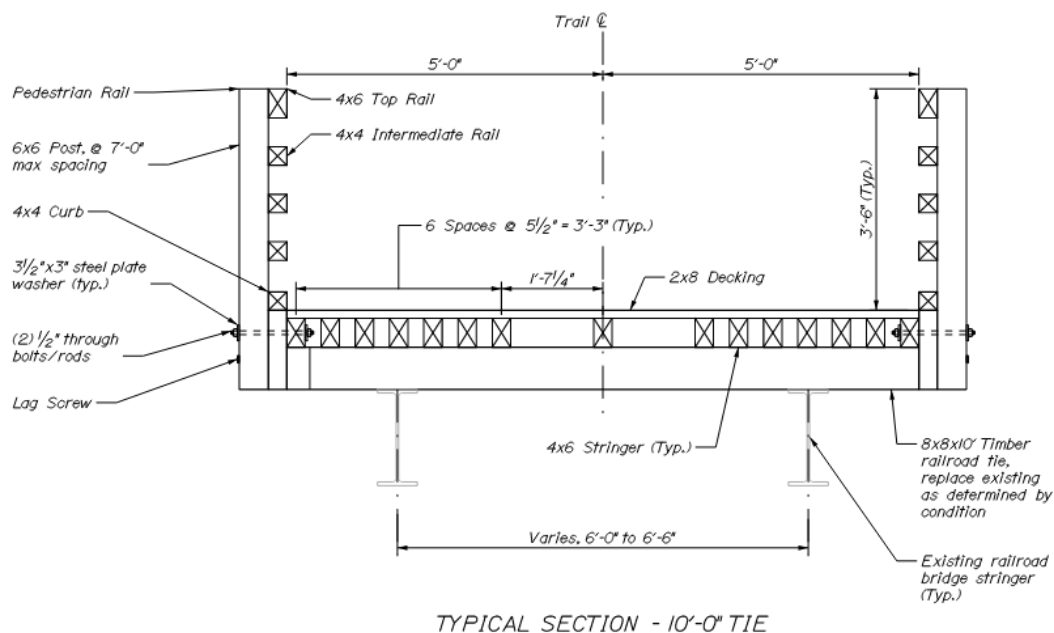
Proposed Bridge Typical Section 10'-0' Tie
